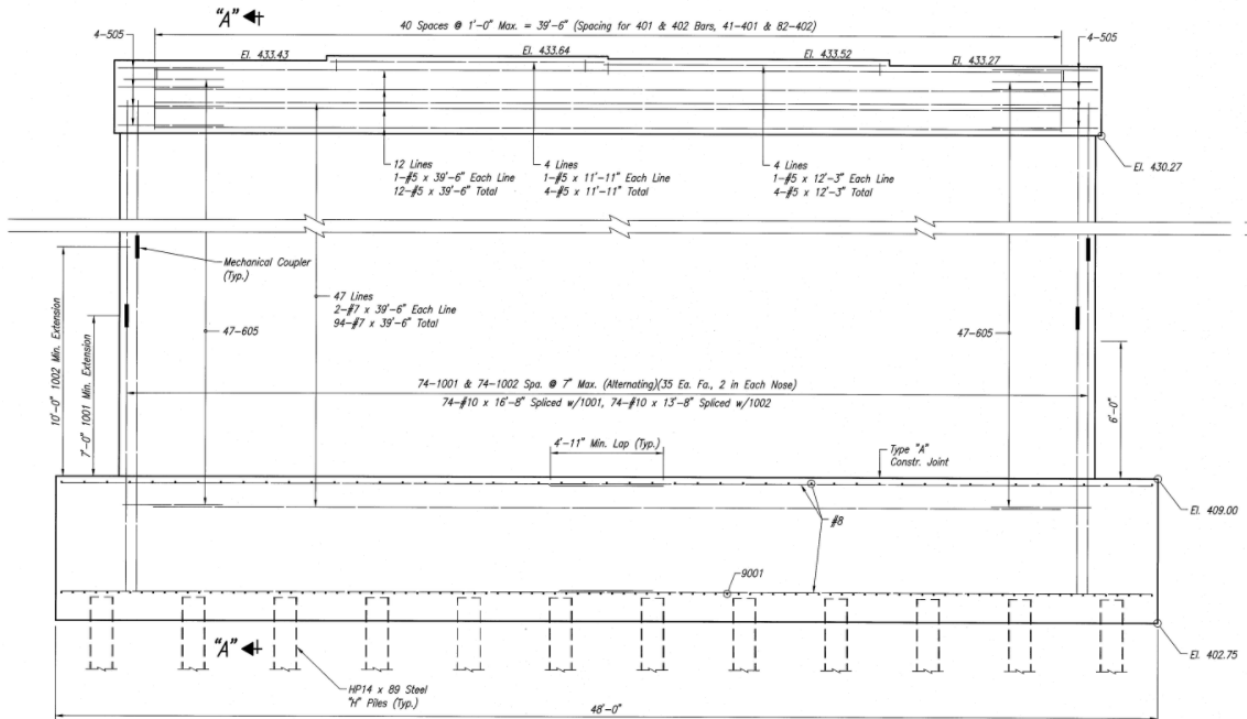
Transverse Elevation of Interior Pier (NBI 80182) (2010)
